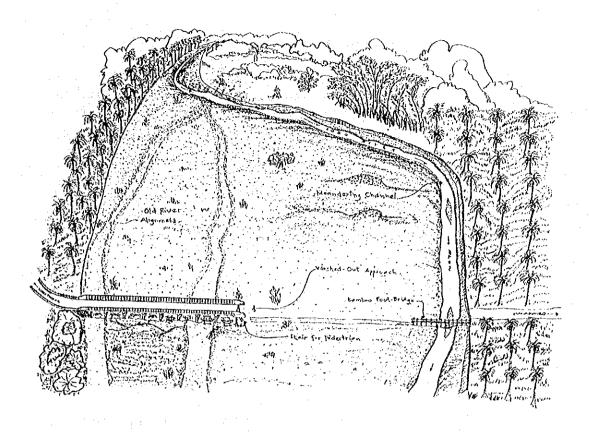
SIDE VIEW SKETCH OF LOBO BRIDGE (BS-33)
